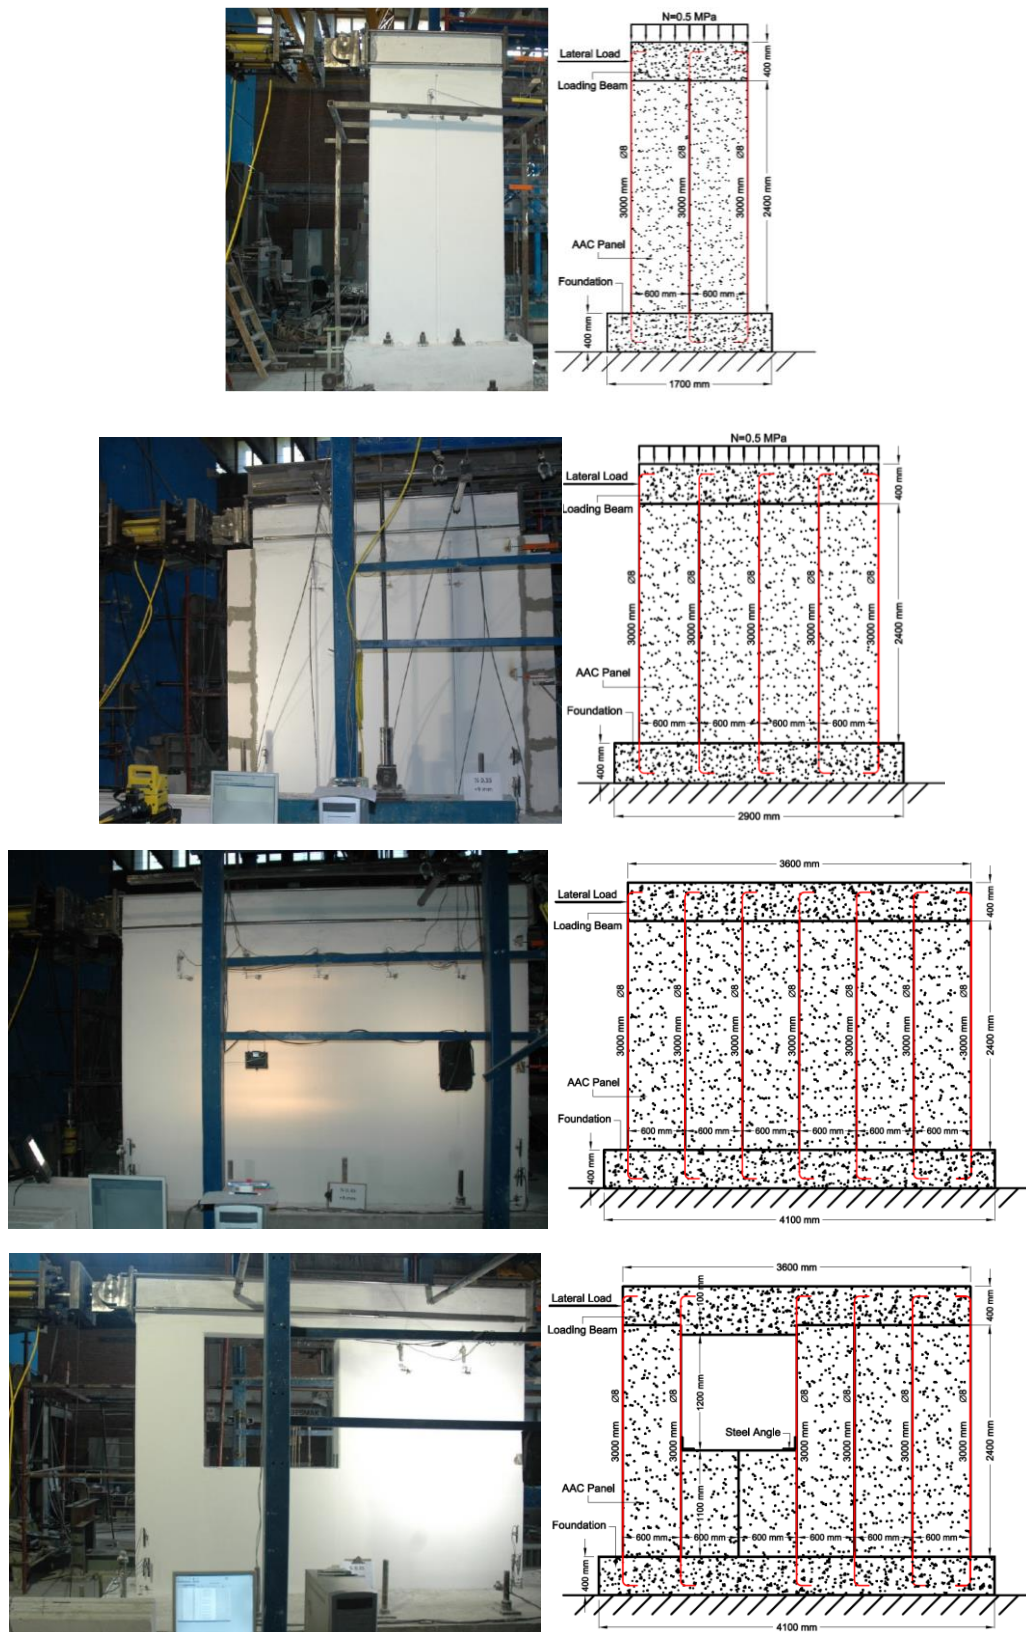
Details of the wall specimens (Taghipour, 2016)
